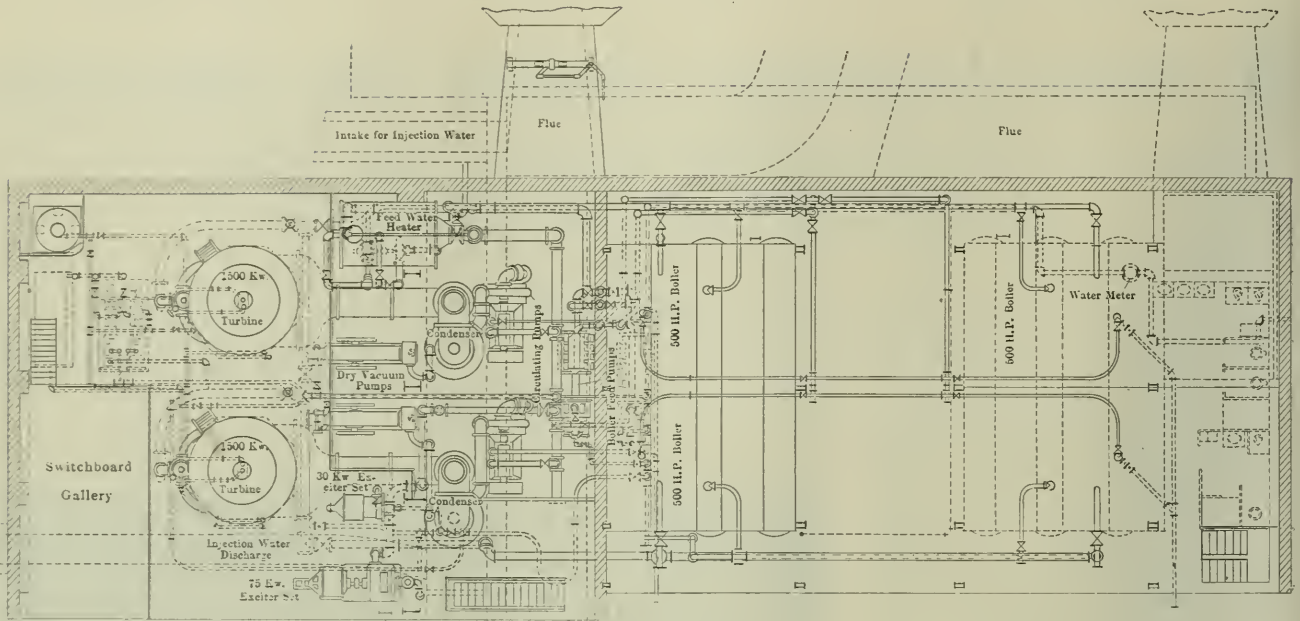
PLAN OF POWER PLANT AT EAST BRIDGEWATER
